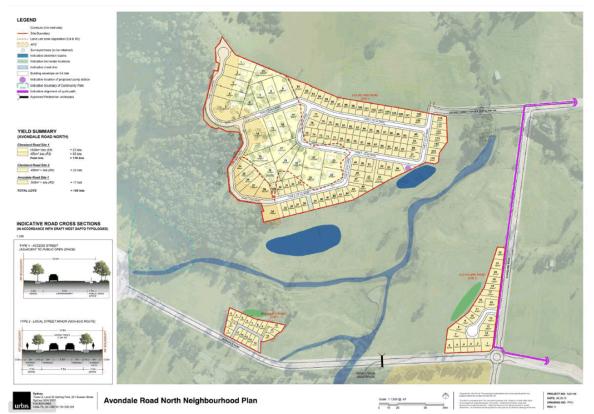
Avondale Road North, Huntley Neighbourhood Plan
